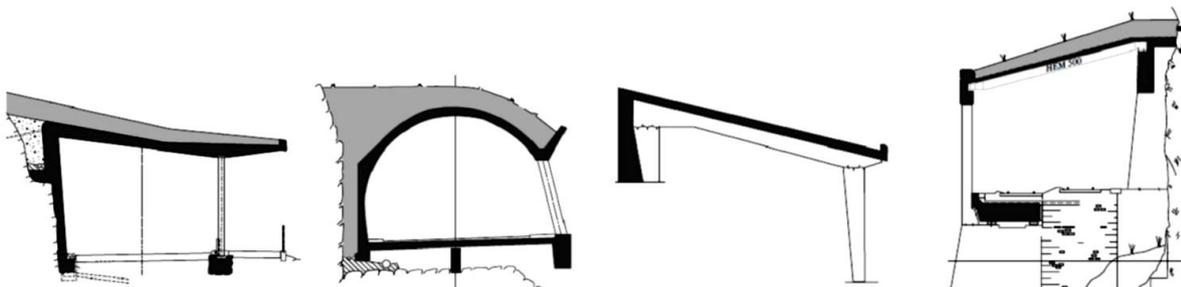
Typical rockfall gallery constructions (Vogel et al., 2009)
